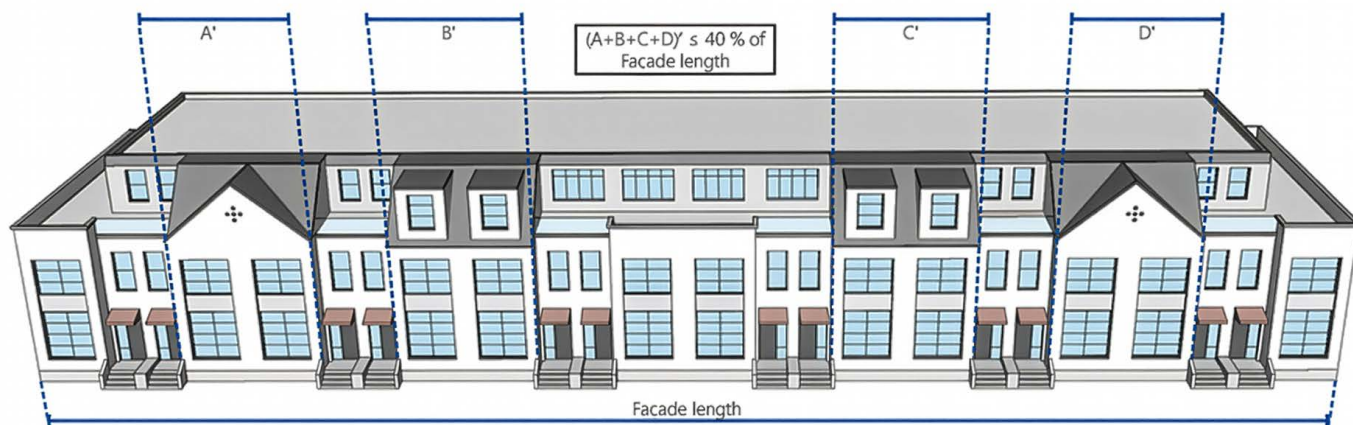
Visible sloped roofs are allowed to encroach into the required Upper Floor Steeback, up to a maximum width of 40% of the facade length.
